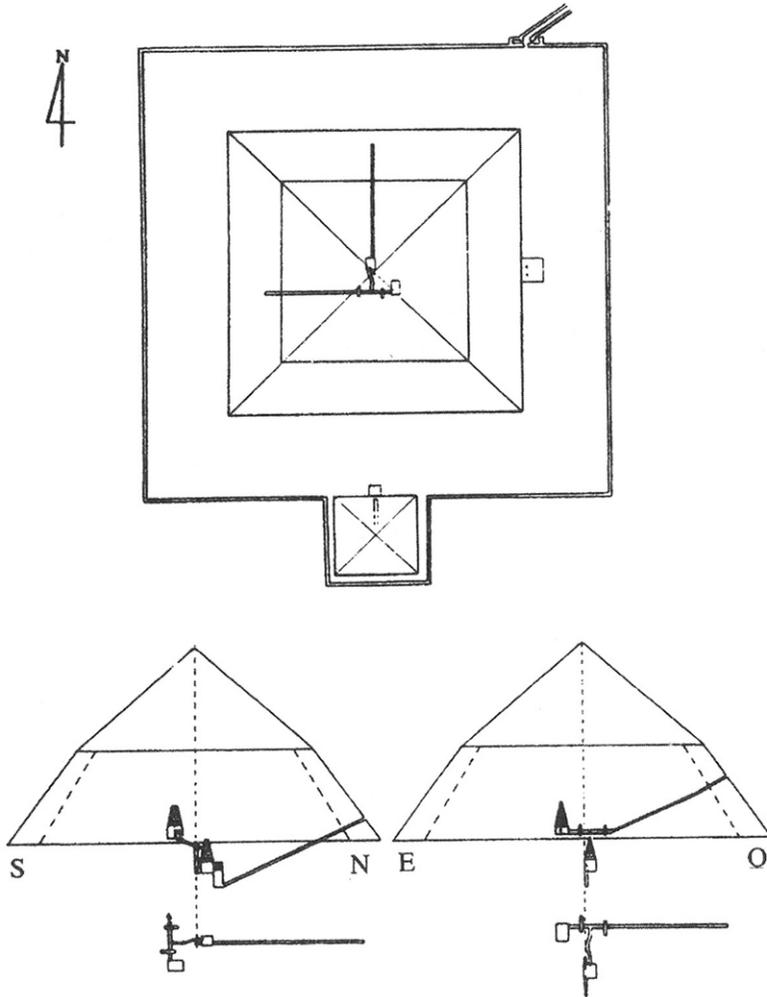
Plan, N-S and E-W sections of the Bent Pyramid.
